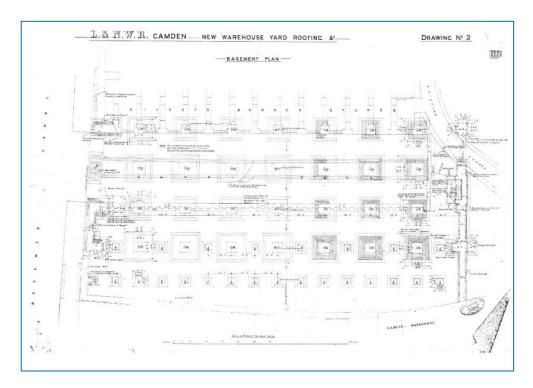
1901 Basement Plan of Interchange Building.<sup>51</sup>
